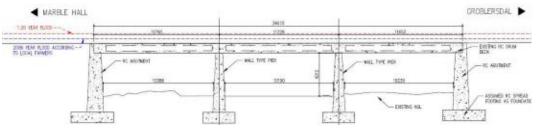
Elevation of Bridge B1050 at km 22.80
